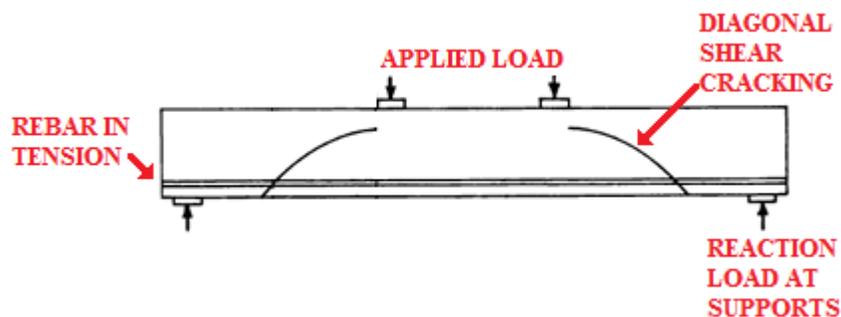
Beam Shear Testing [adapted from ACI-ASCE Committee 326 (1962)]
